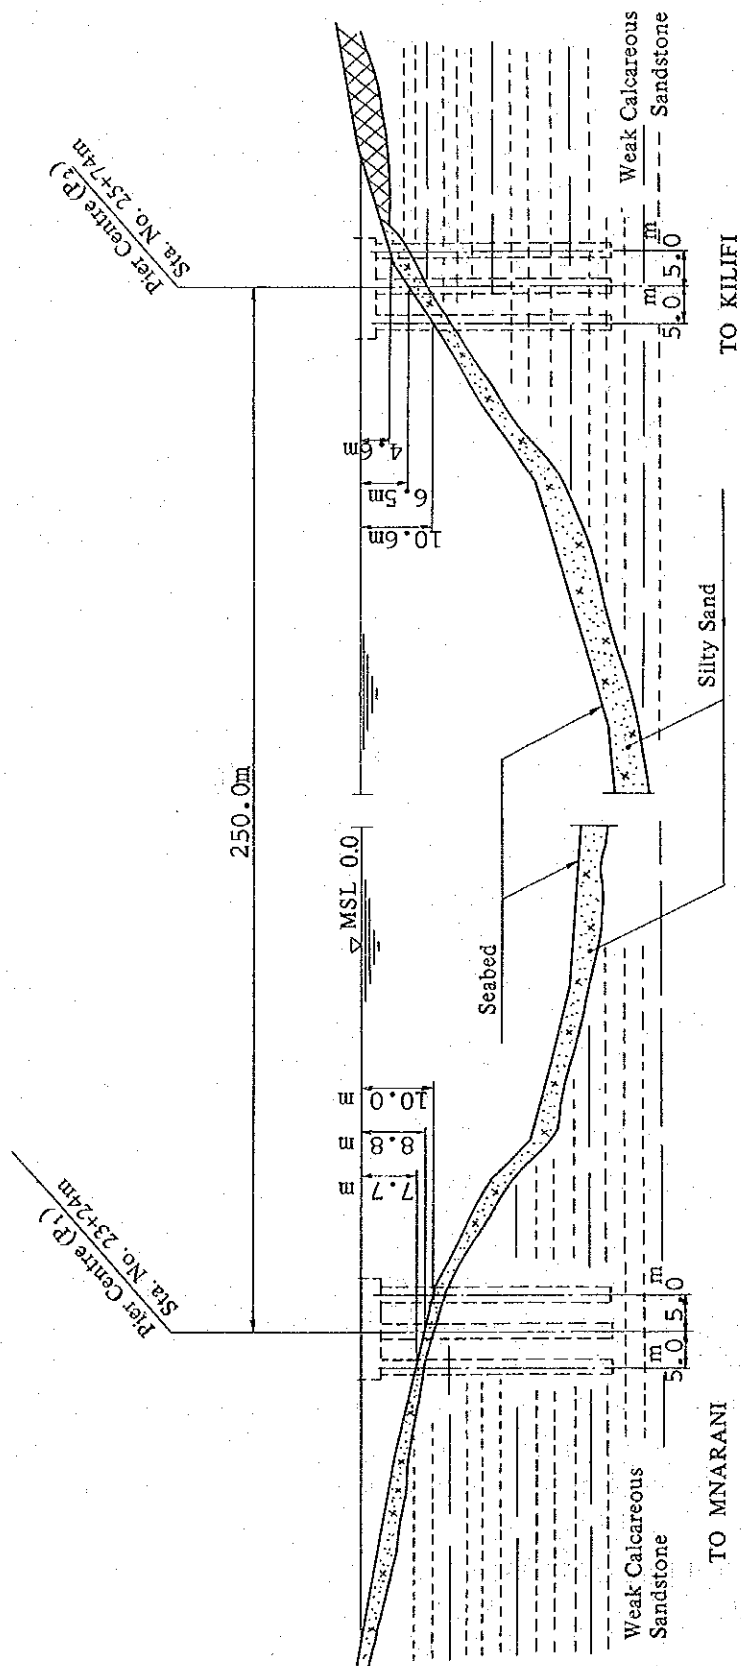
PROFILE AND SUBSURFACE CONDITION OF SEABED AROUND PIERS
